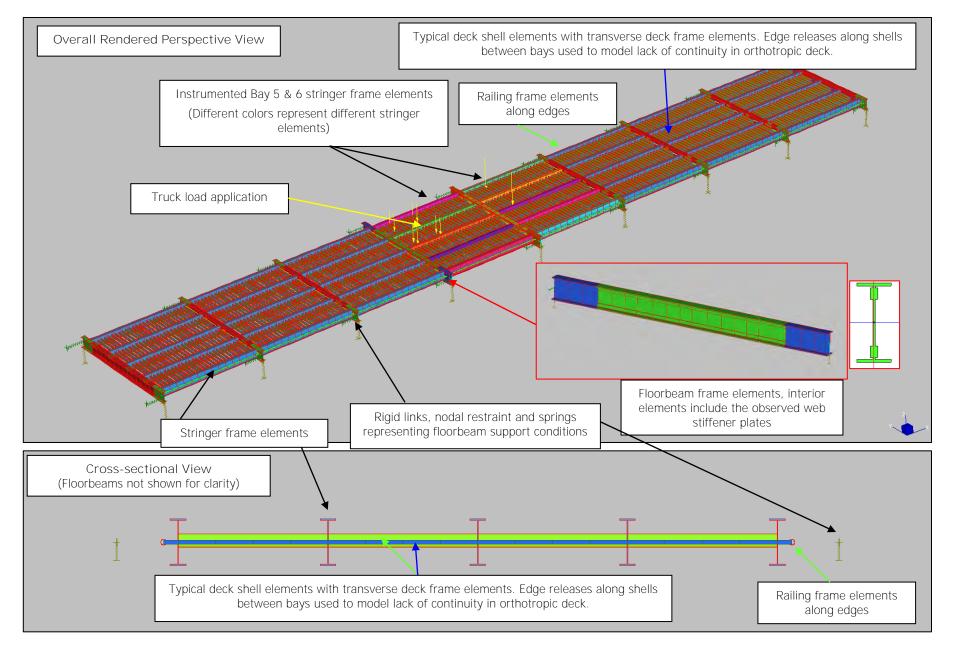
Model Overview of Span 2 floor system FEM illustrating test truck on the bridge
